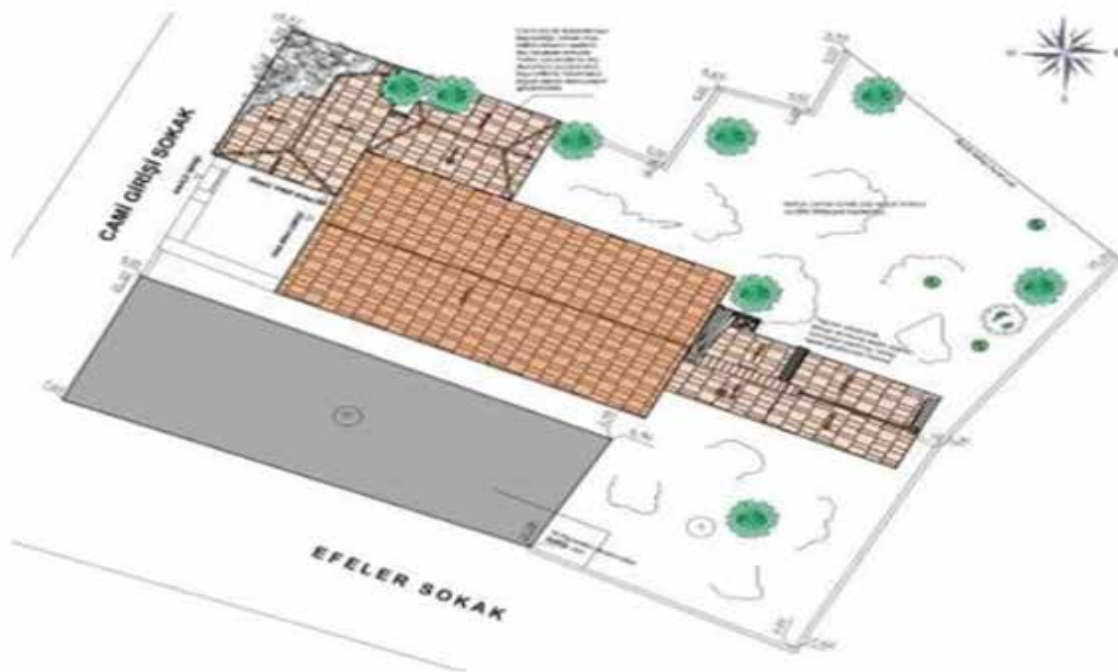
Situation plan, Source: Arch. SEDES, F.
